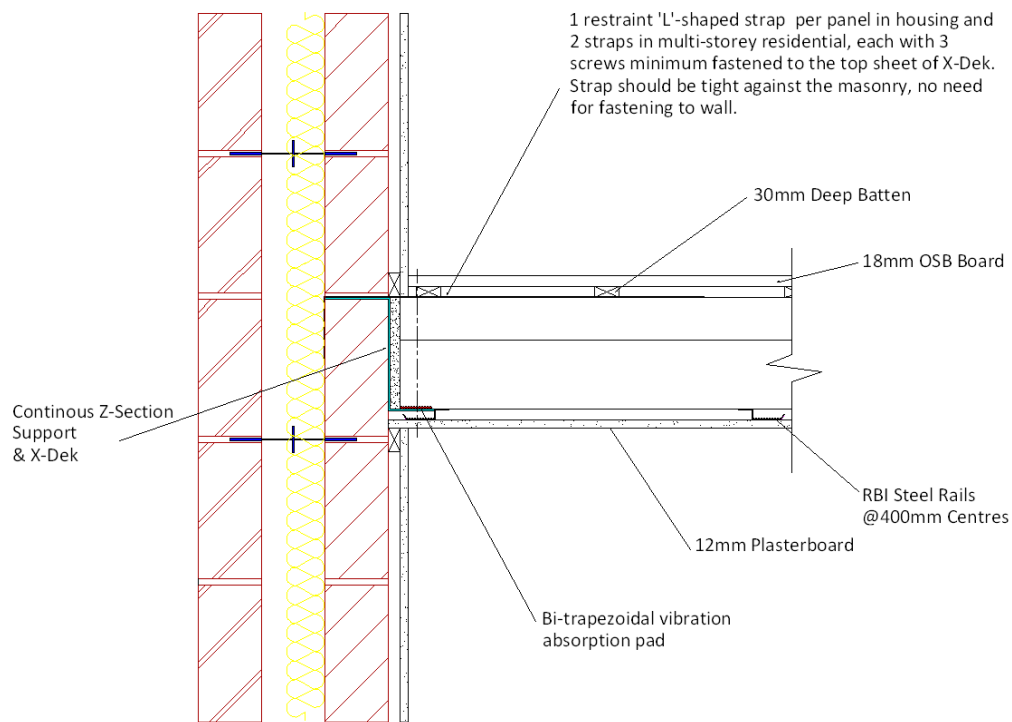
Detail of *Floor-Dek* as floor in housing attached to blockwork
